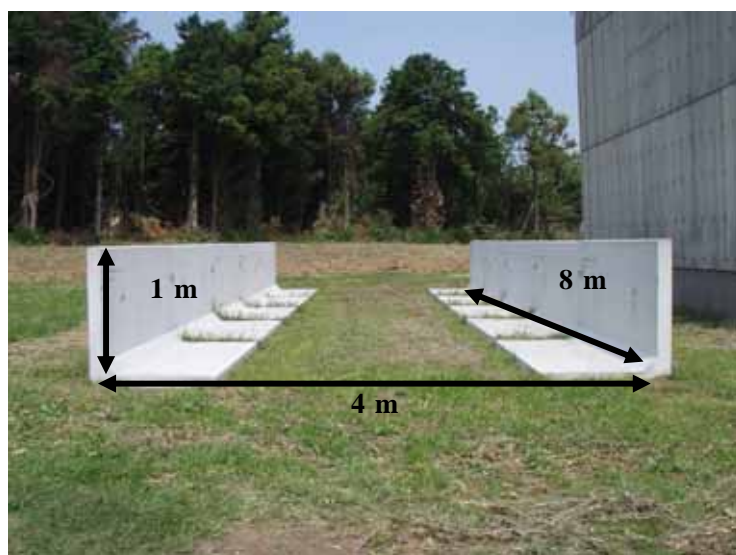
Overview of the bunker silo constructed the L-shaped concrete retaining wall
